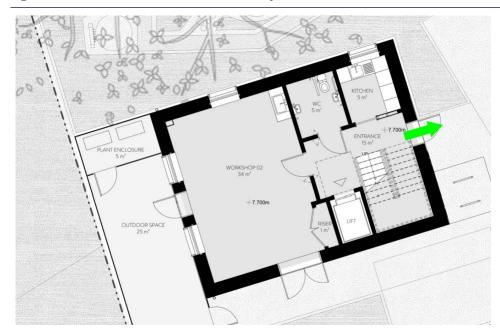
Exit locations on Ground Floor – Richmond Maker Labs
